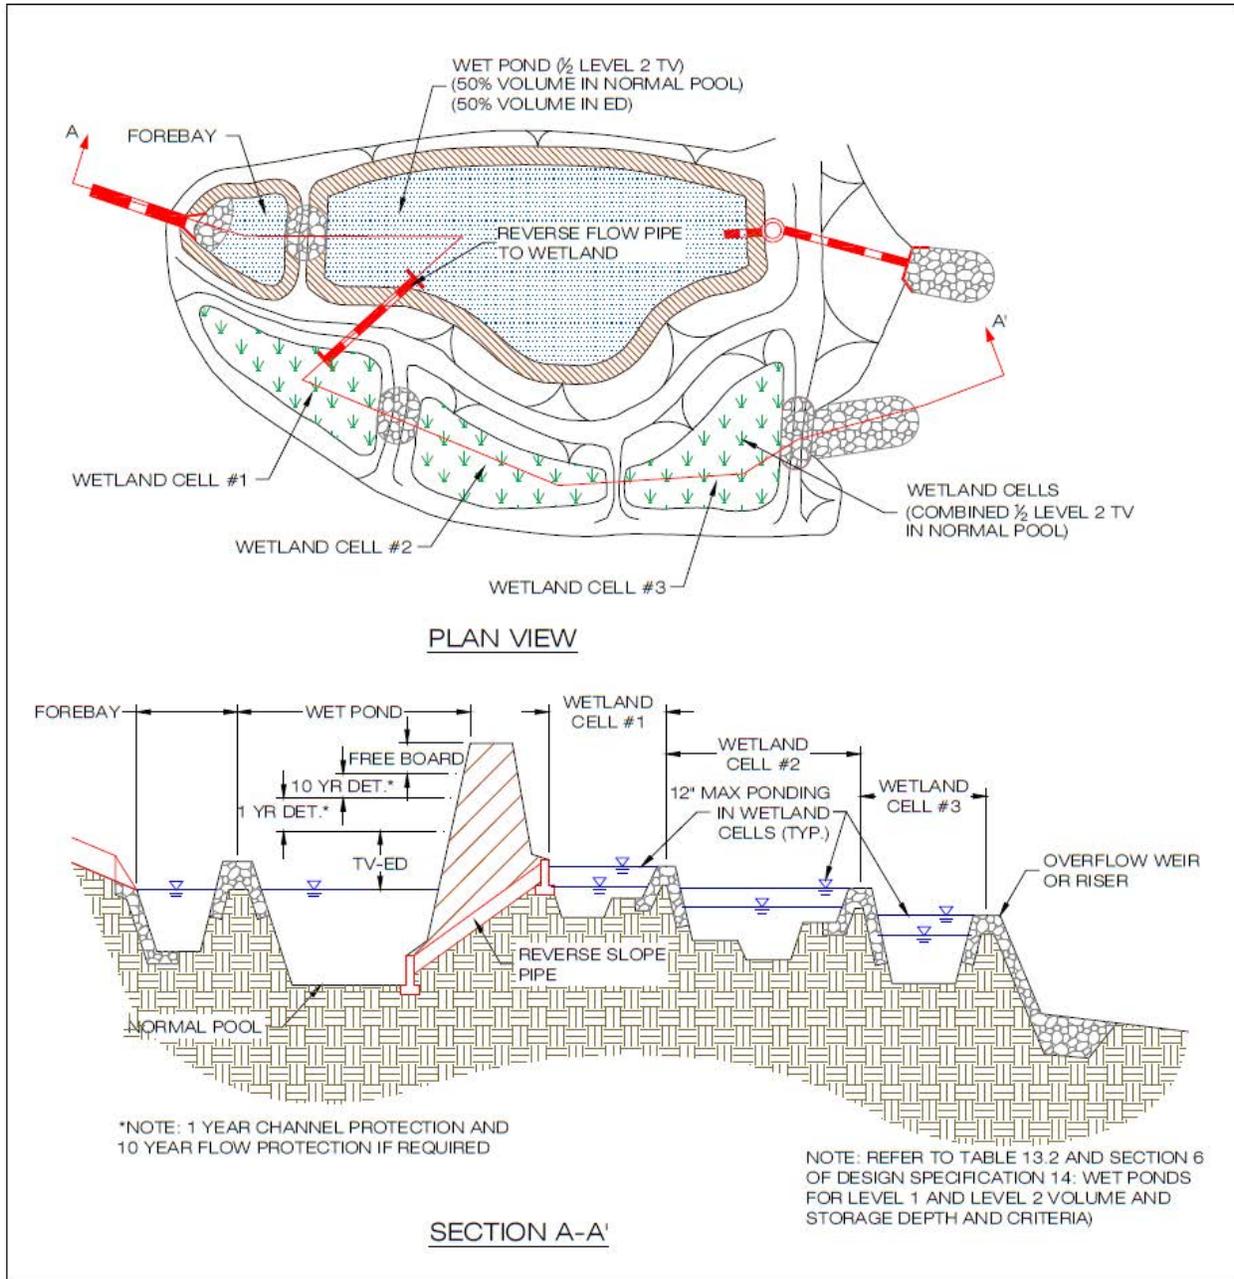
Constructed Wetland Level 2 – Pond-Wetland Combination– Plan and Section
